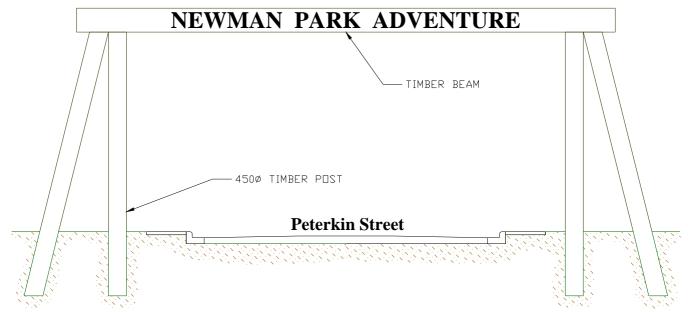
Impression of the Newman Park Adventure Gateway across Peterkin Street
